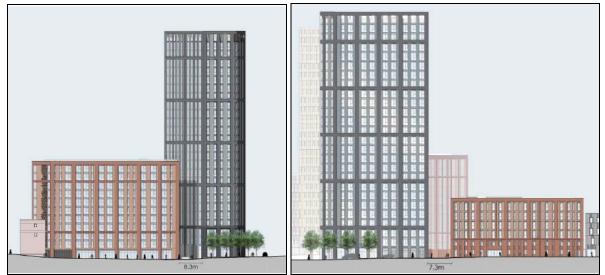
Views of the three blocks from Lancaster Street and Princip Street
